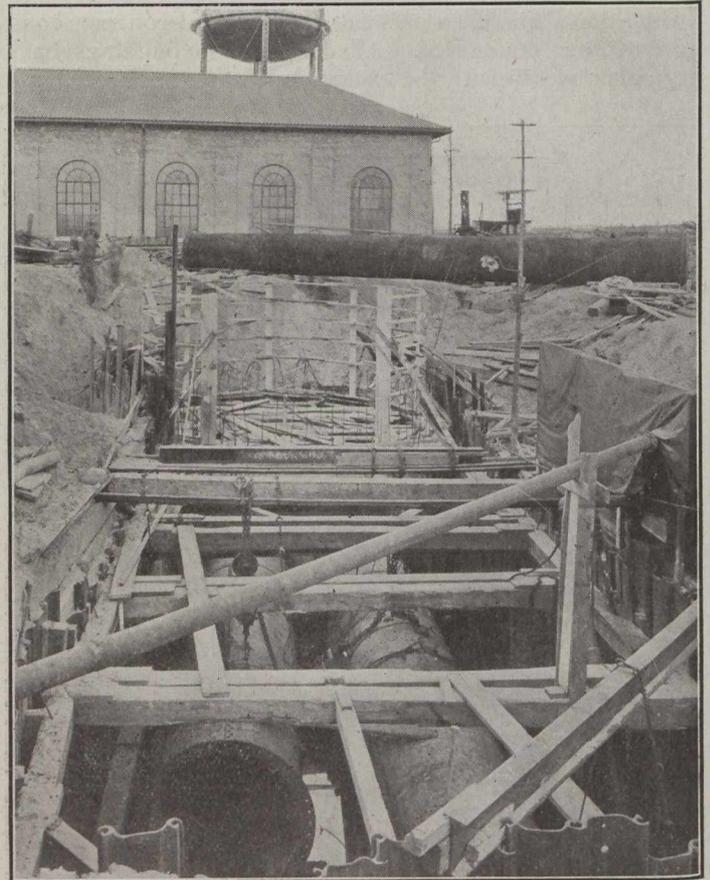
View of Intake Pipe Trench at North End, Showing Commencement of Laying Two Lines of 72-inch Steel Pipes.
